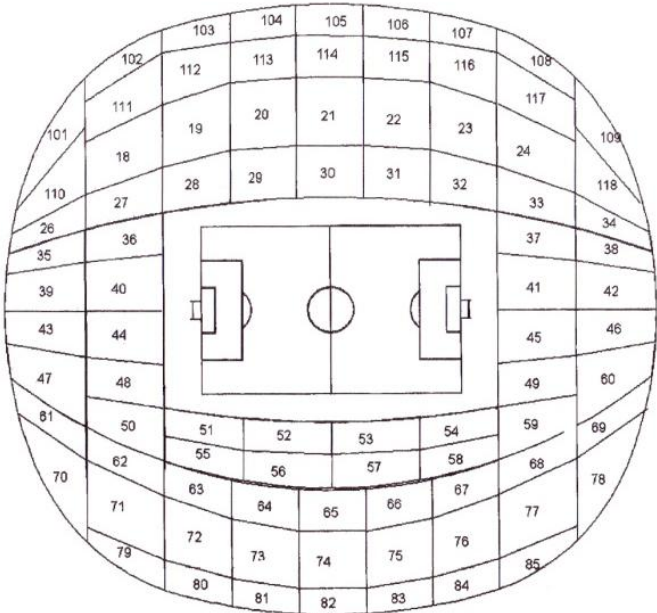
Panel layout for pressure measurements on a model of large stadium roof
